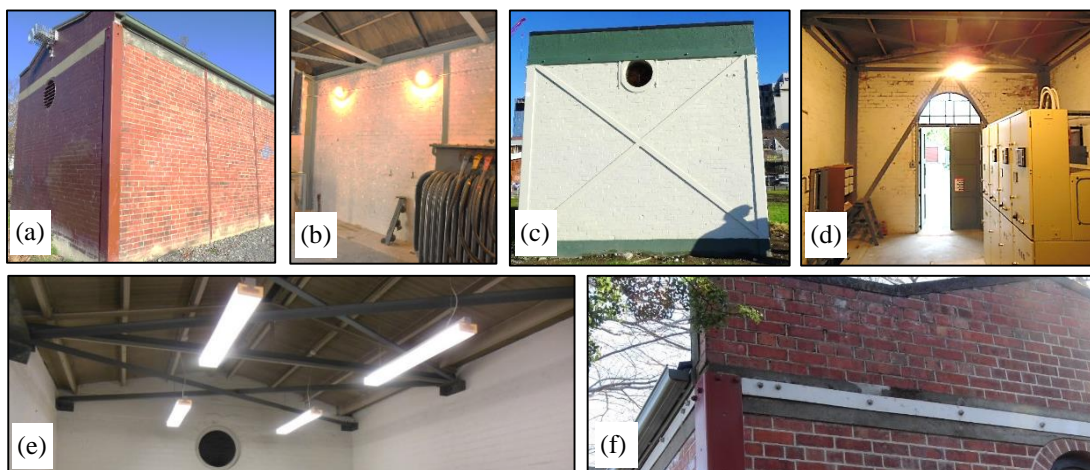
Orion Power substation wall and roof retrofit examples: (a) External vertical steel plates and angles; (b) Internal vertical steel plates and angles; (c) External diagonal steel plates; (d) Internal diagonal steel plates; (e) Typical roof bracing of flexible diaphragm; (f) Steel plates mounted on perimeter beam.
